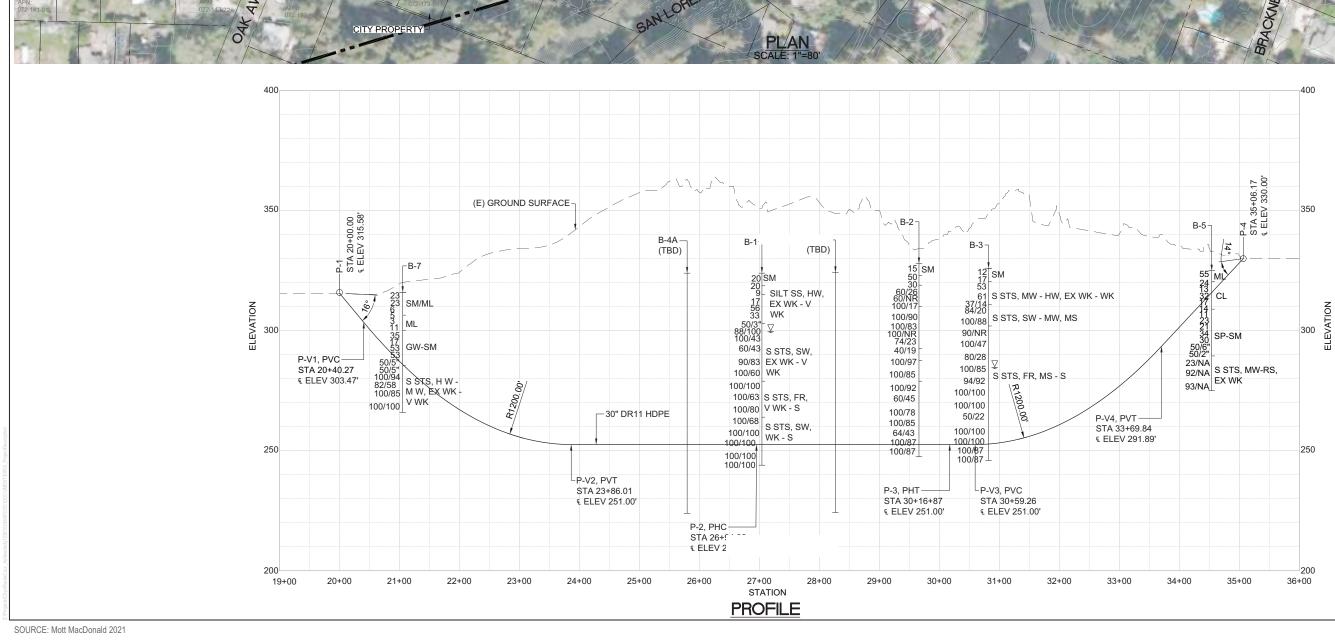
Proposed Brackney North Pipeline Section Alignment Newell Creek Pipeline Improvement Project
